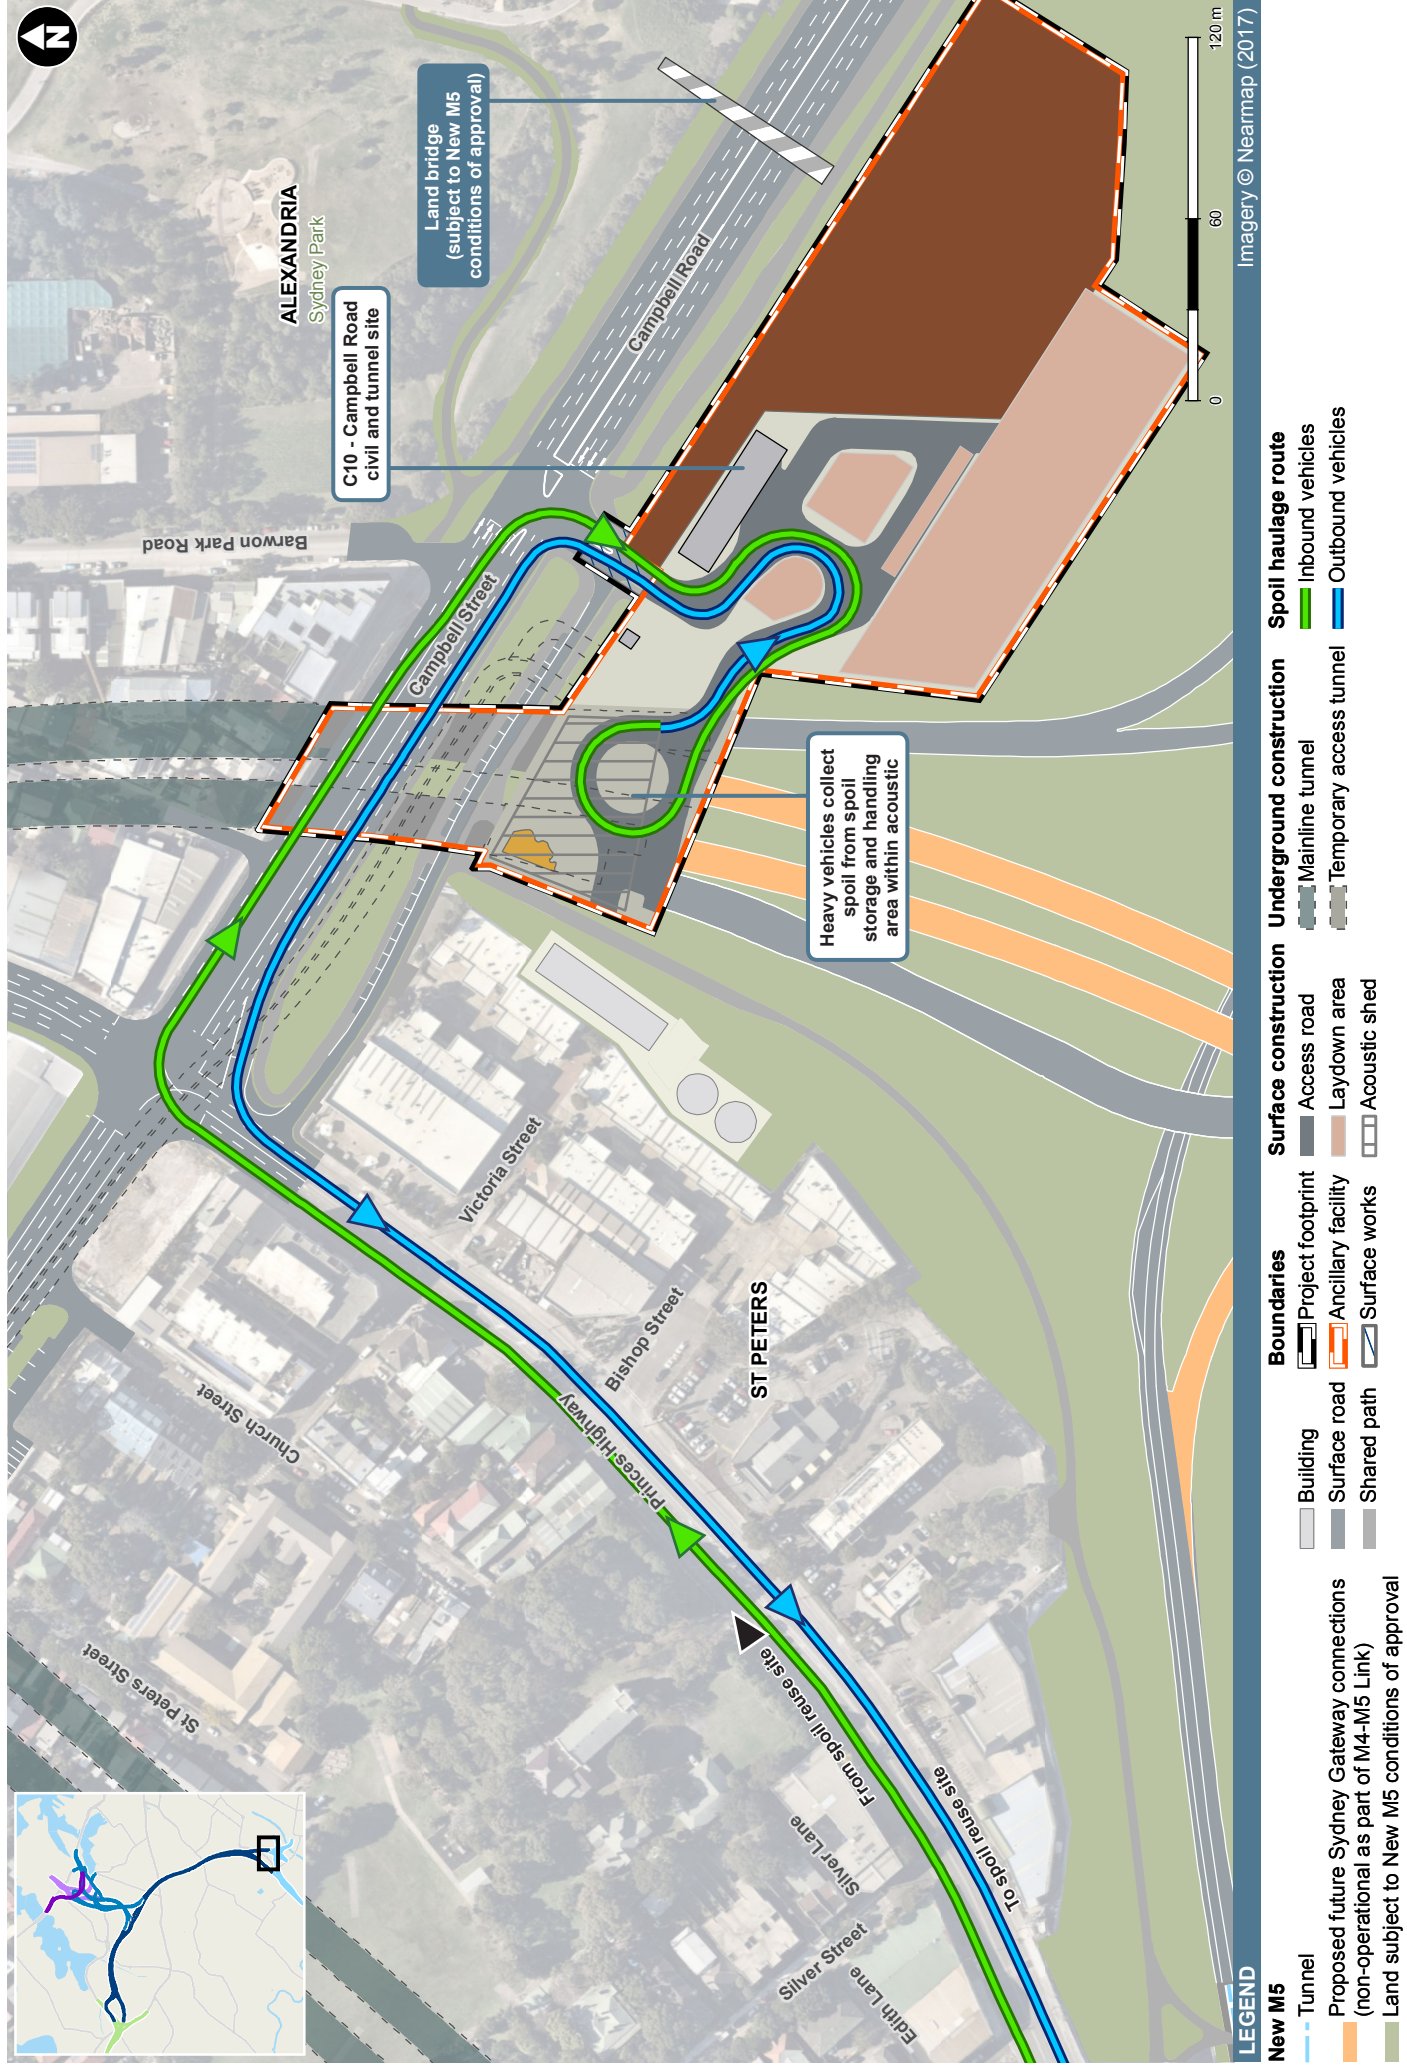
Indicative spoil haulage route – Campbell Road civil and tunnel site (C10)
